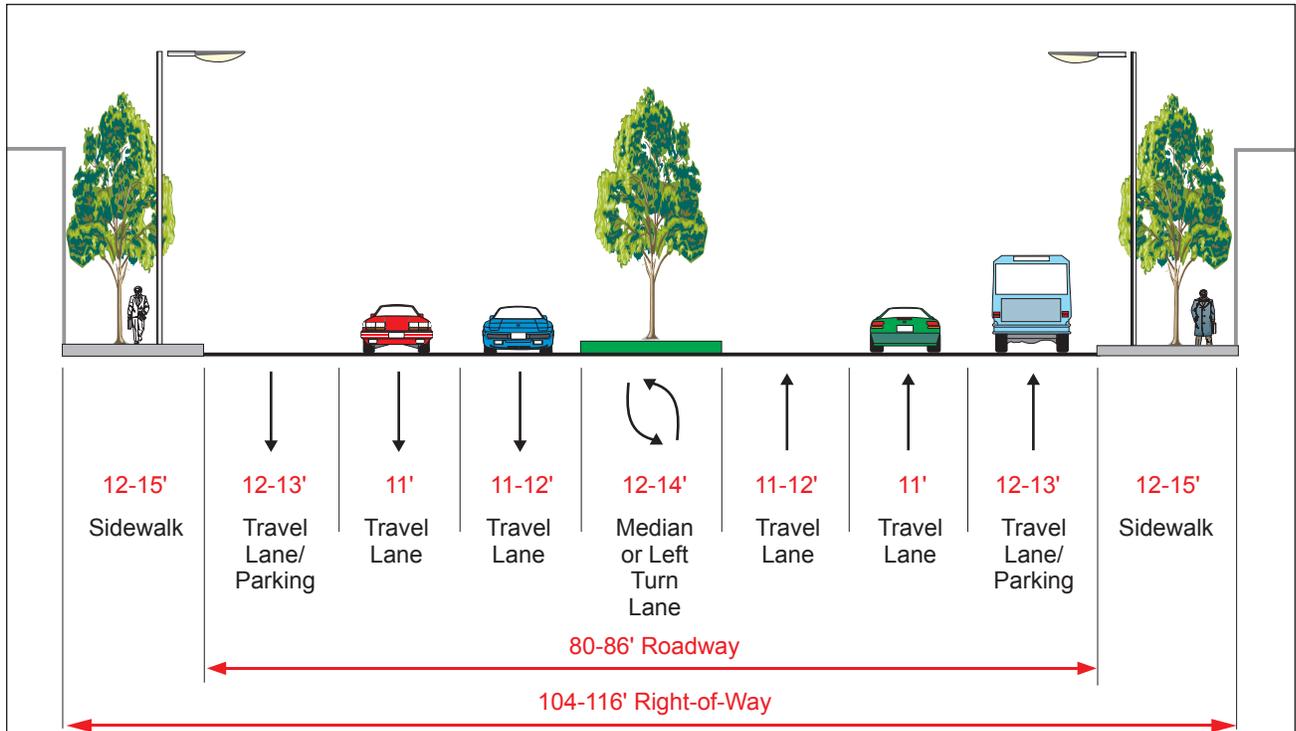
Proposed Street Standard Section for Long Beach Boulevard - South of Firestone Boulevard
